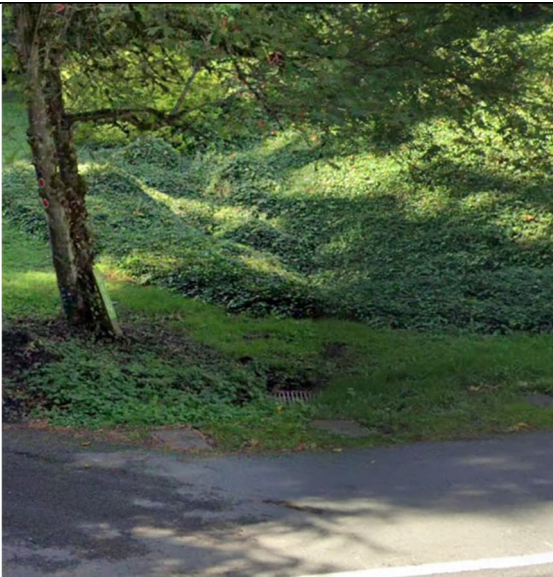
(looking northwest): type 2 catch basin. 12" concrete pipe flowing east.
